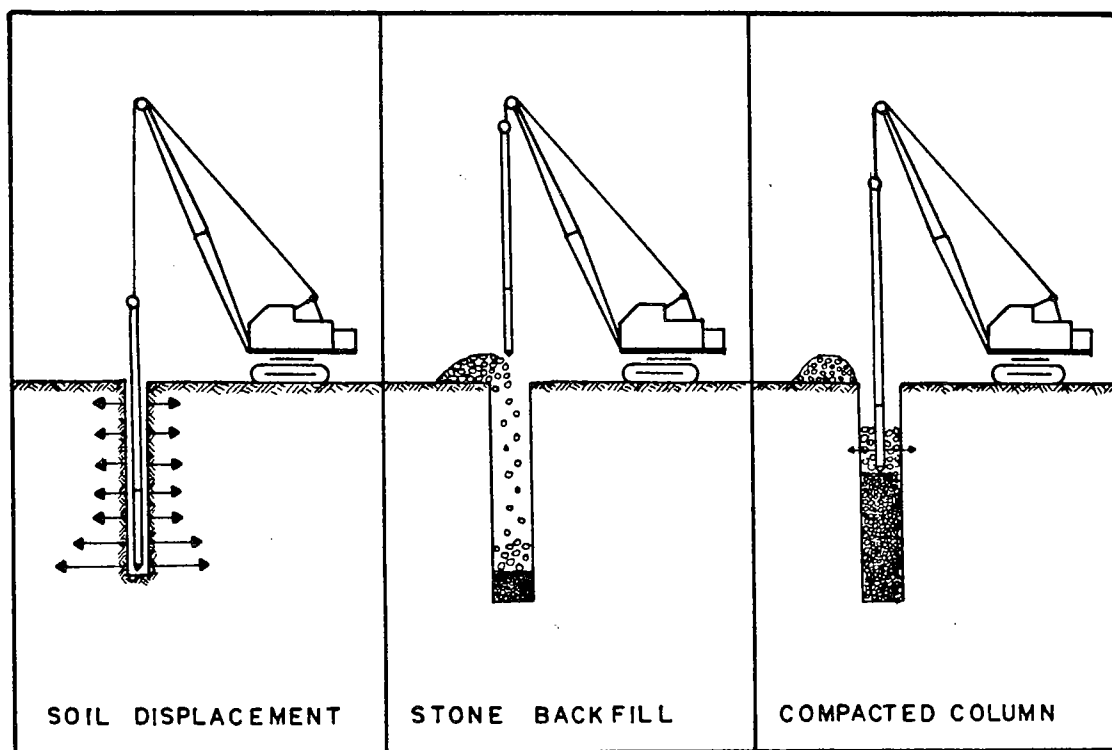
CONSTRUCTION OF STONE COLUMNS BY THE DRY (VIBRO-DISPLACEMENT) METHOD.
